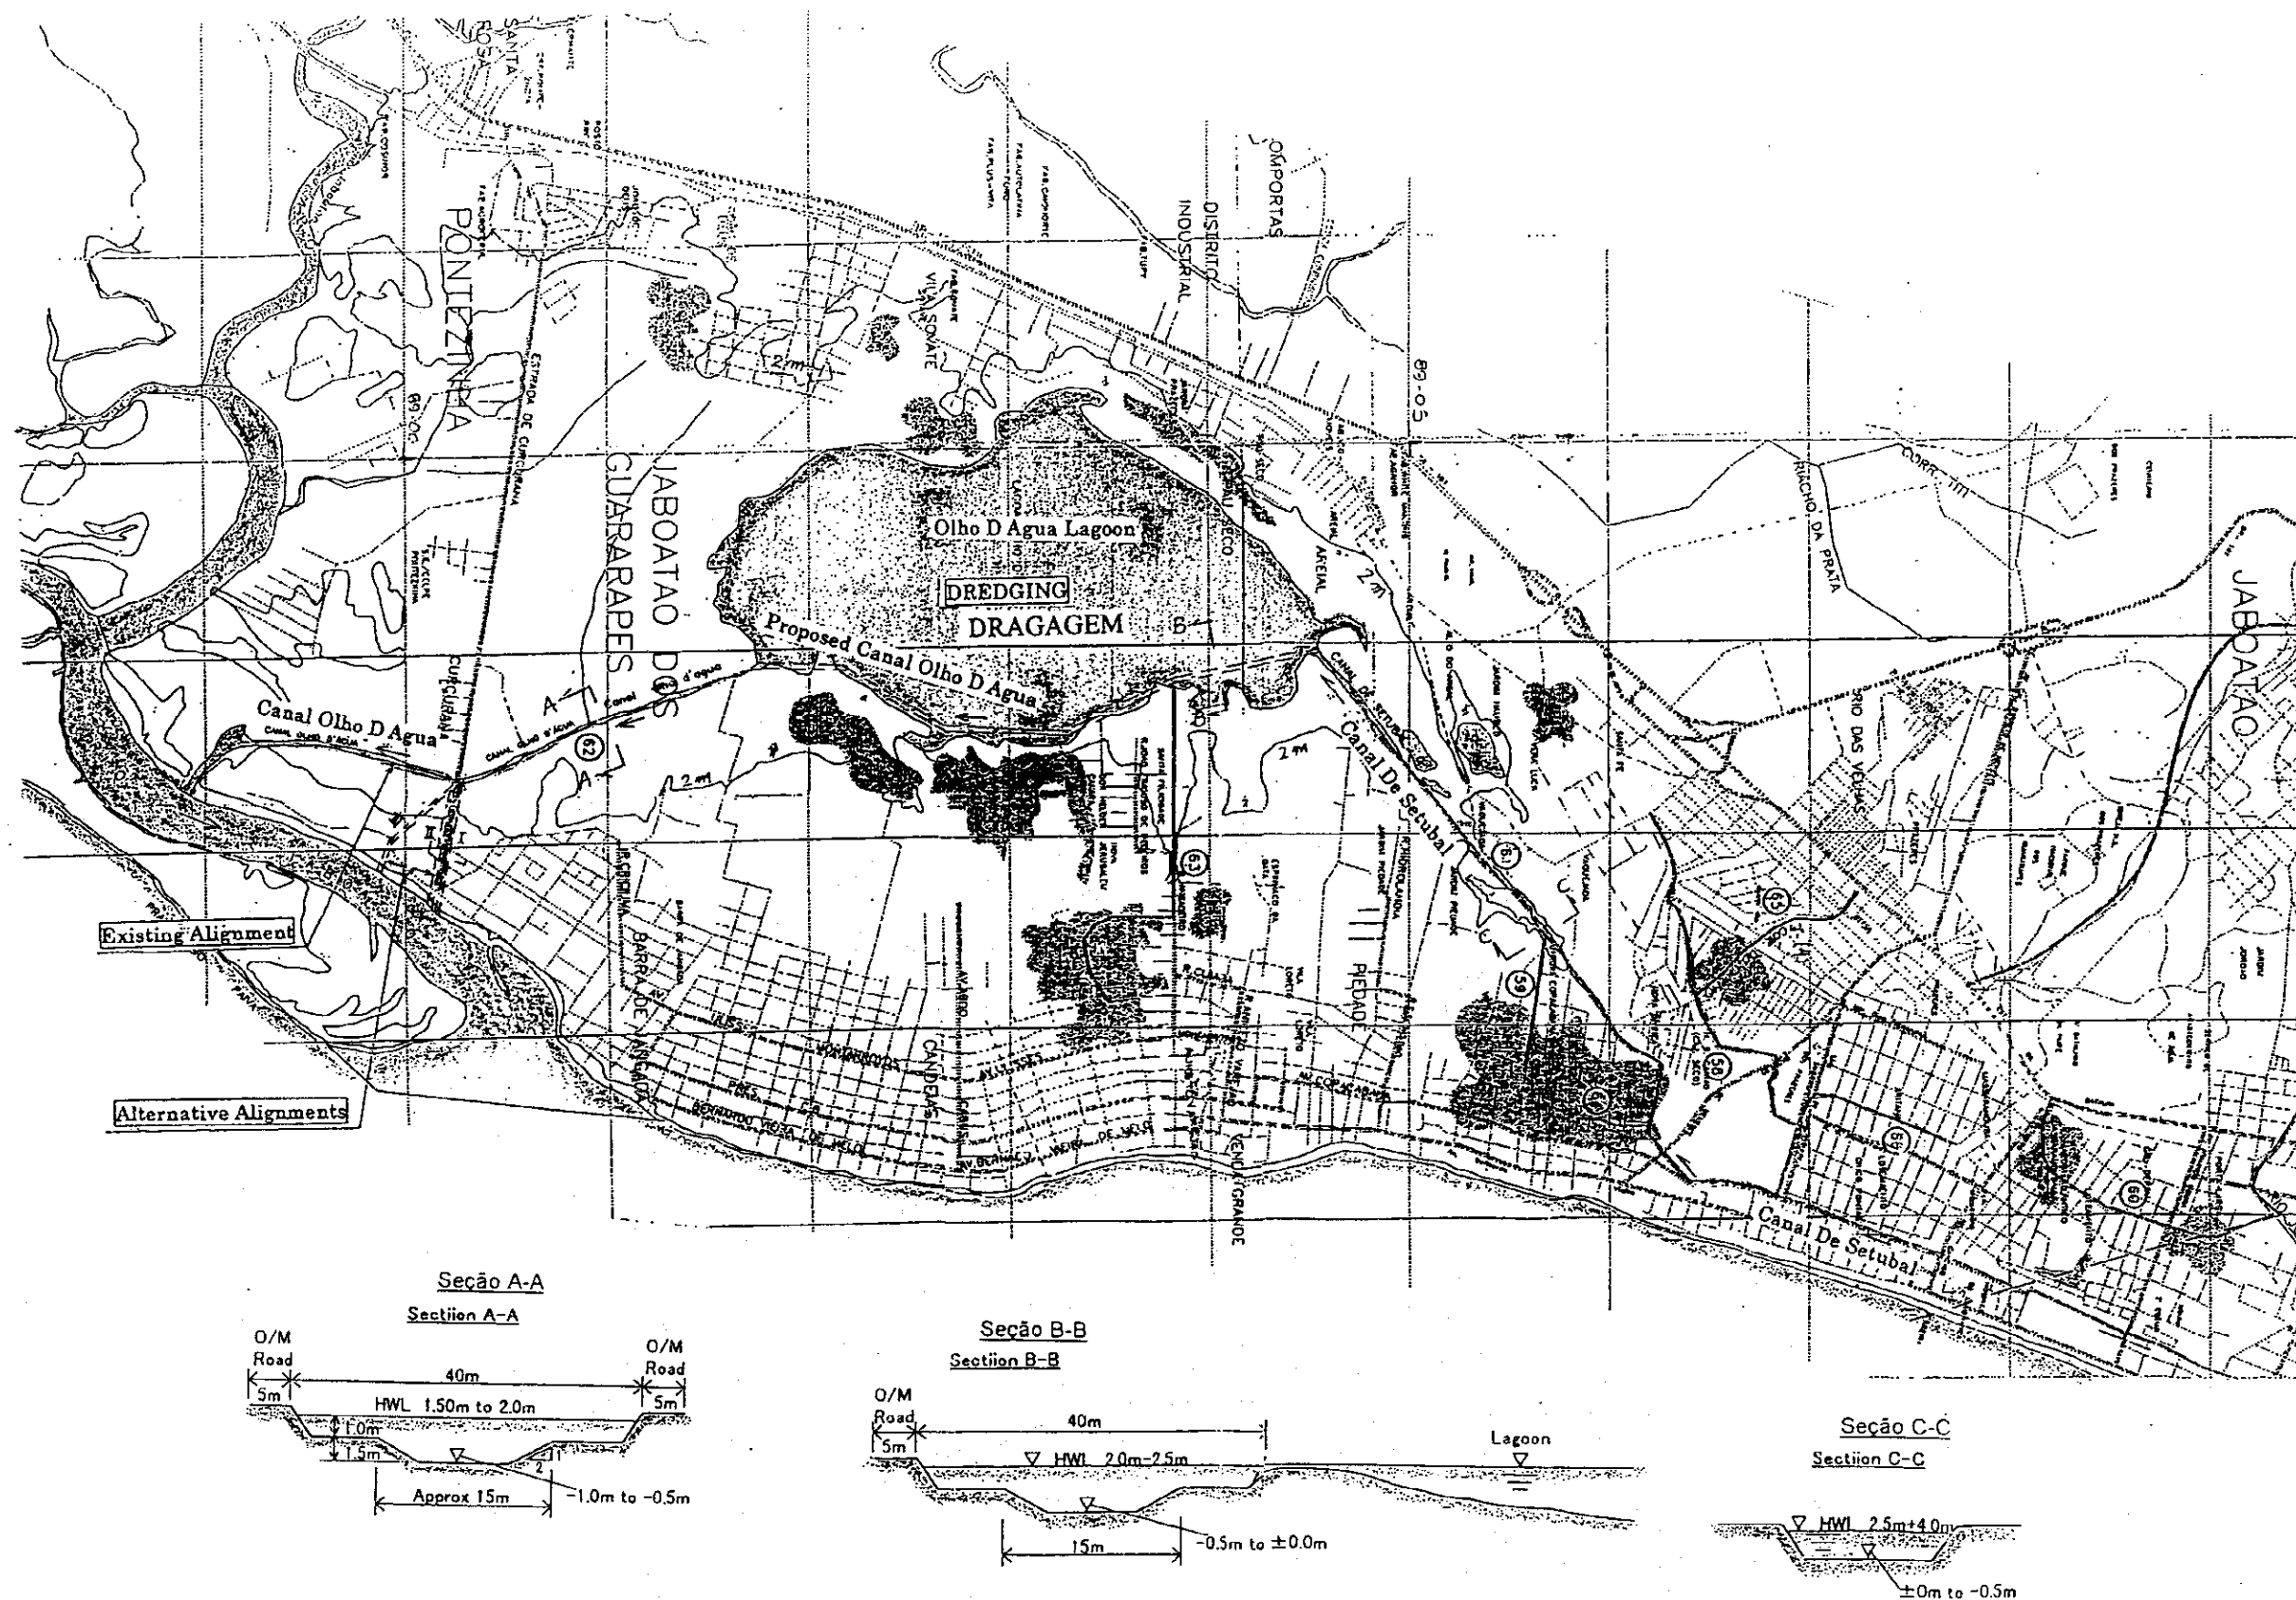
(1/3) Concept of Drainage Improvement Plan for Canal Olho D'Água
